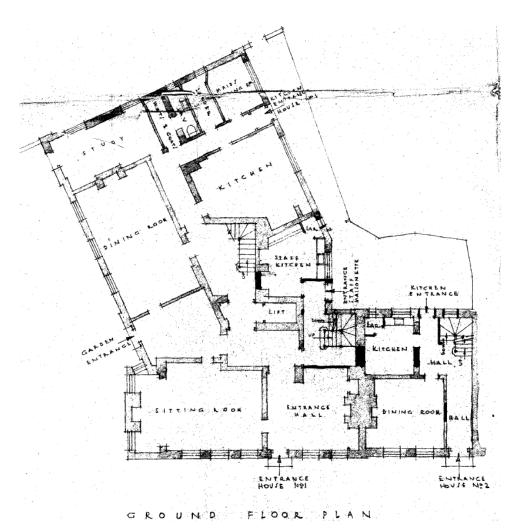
Approved Ground Floor Plan (ref: D6/5/B/5385)
